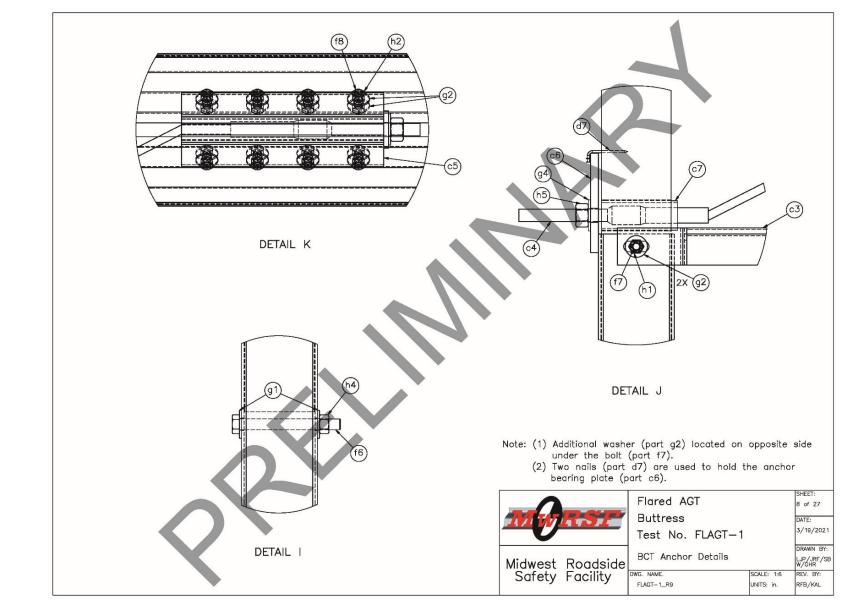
BCT Anchor Details, Test No. FLAGT-1
